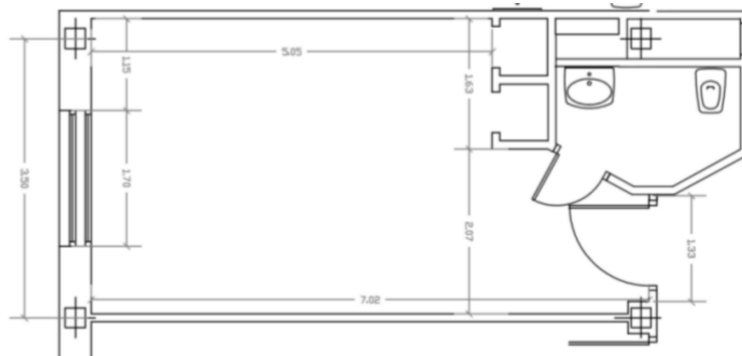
The prototype room plan of Terrassa hospital, Spain.
